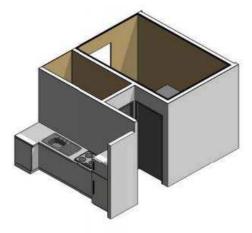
A prefabricated "wet area" pod that incorporates the bathroom, toilet, laundry and kitchen with all services having been installed prior to delivery to site. In some cases the same module has the mezzanine staircase installed.
